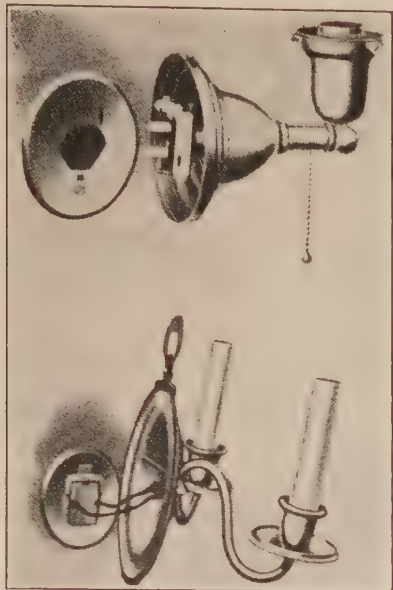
VIEWS SHOWING RIGID AND FLEXIBLE TYPES OF WALL BRACKET CONNECTIONS
